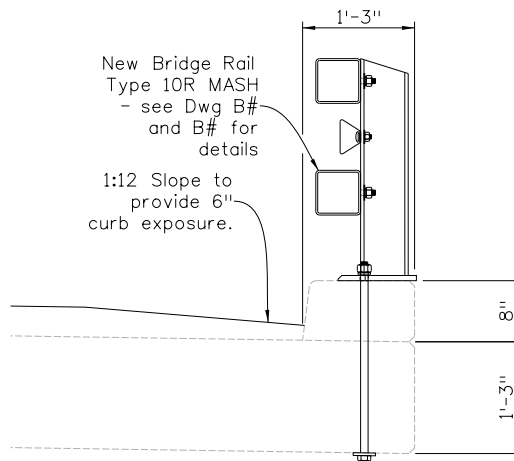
(A)-3 Sample Section showing paving detail and Post Connection
